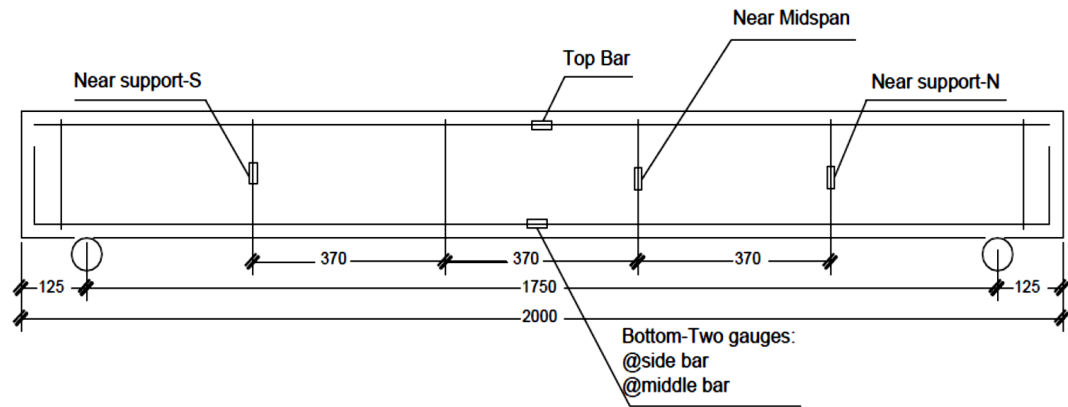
Details of the stain gauges attached to the longitudinal rebars and stirrups
